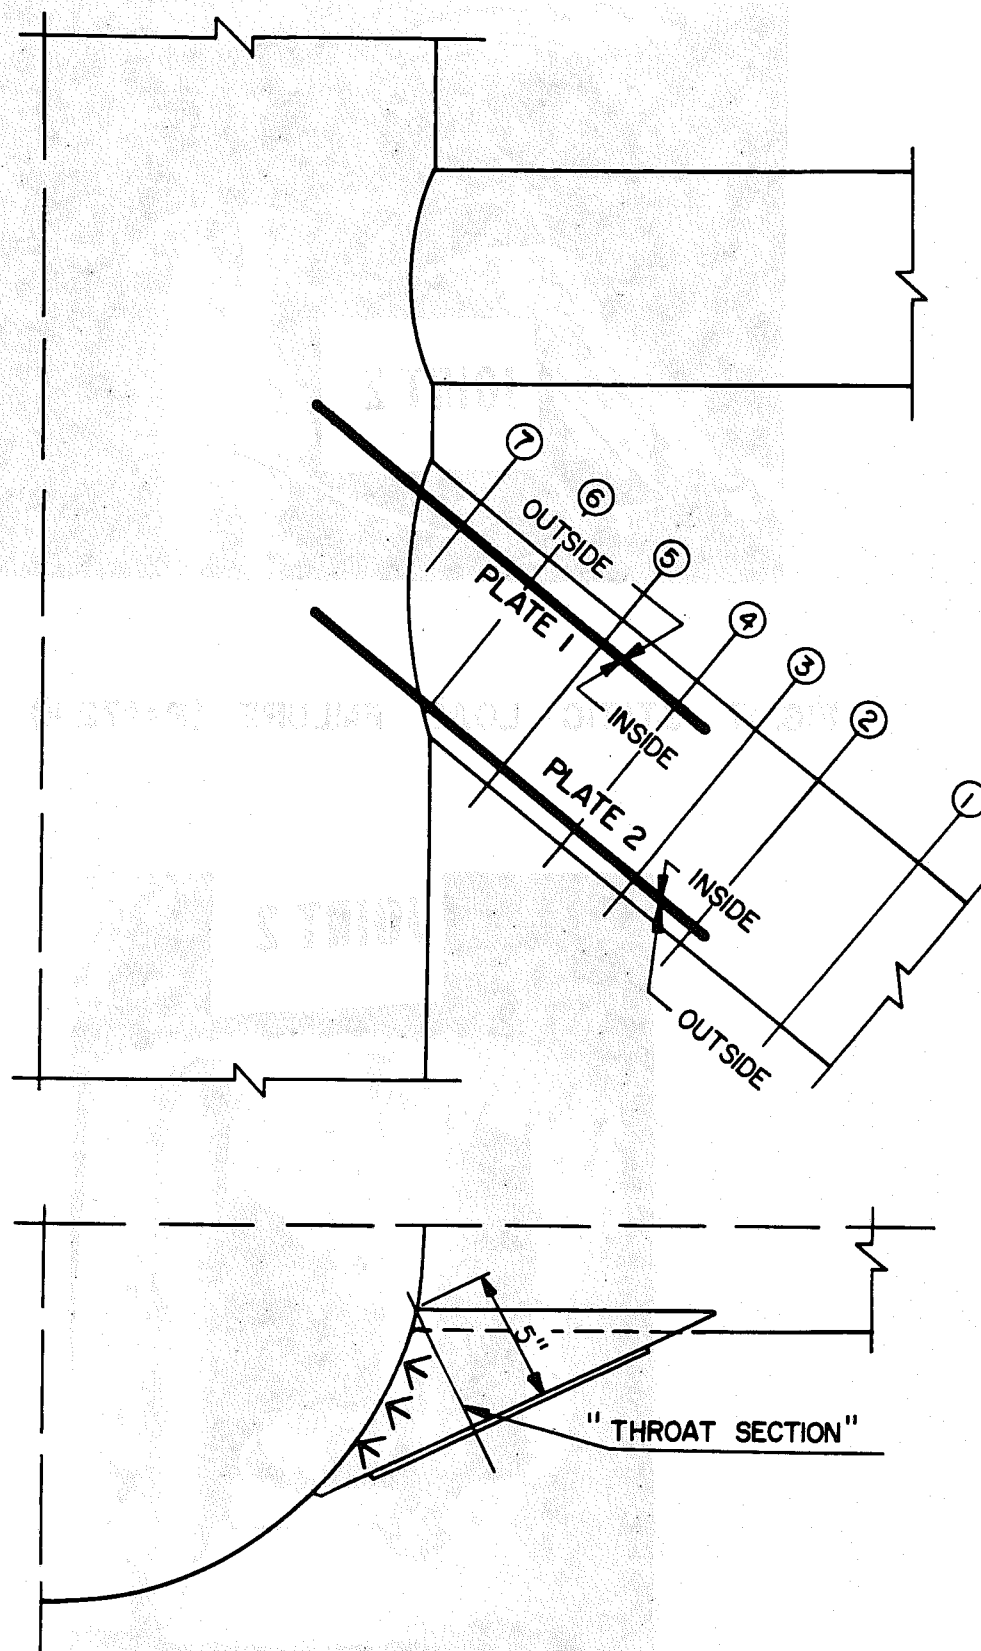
INSTRUMENTED SECTIONS-REVISED WING PLATE DESIGN
